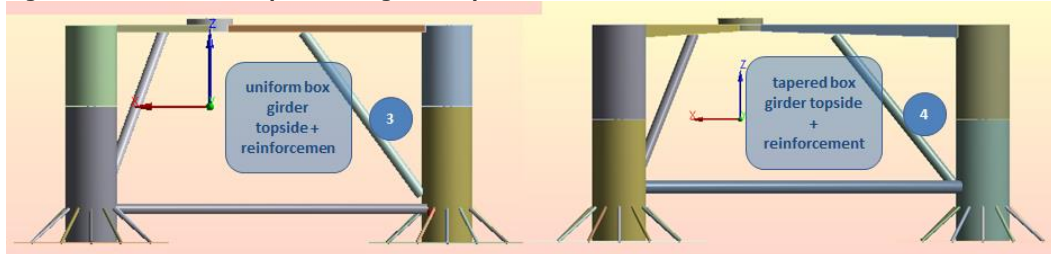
Uniform and tapered box girder topside with added reinforcement cross bracing
